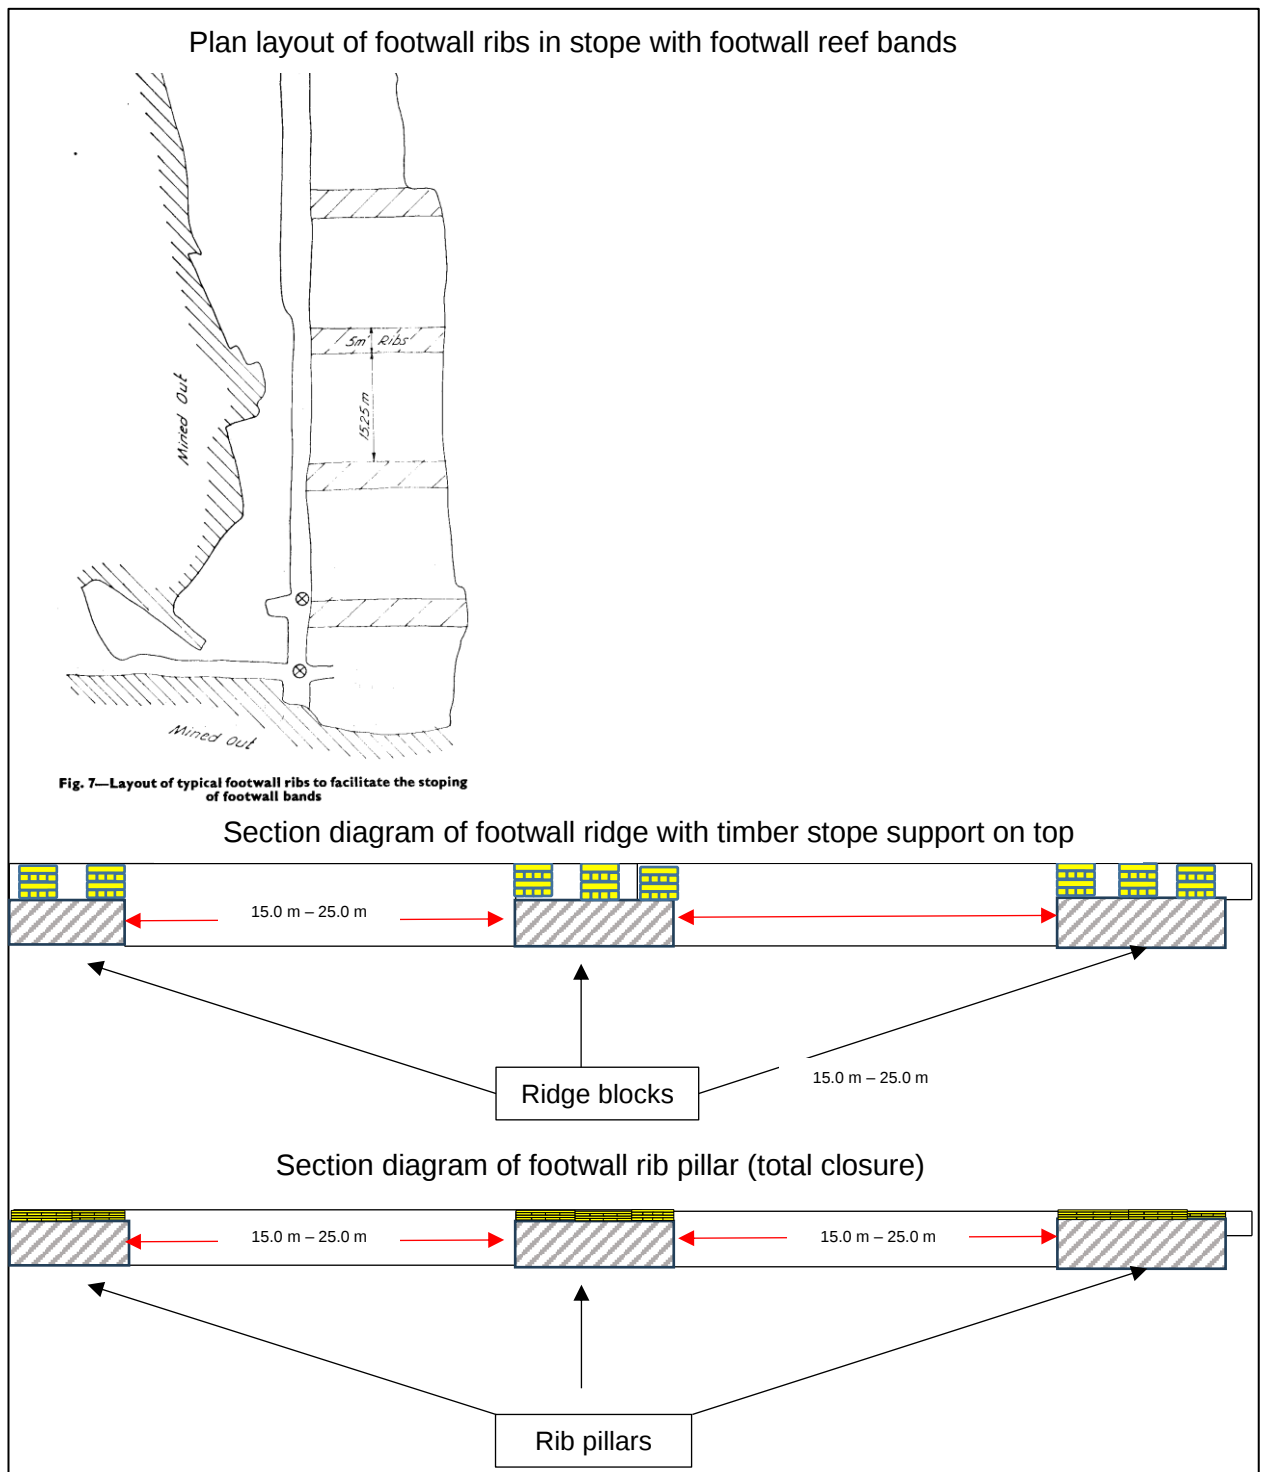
Layout (top) and section diagram (bottom) of footwall ribs for stoping of footwall bands (More O'Ferrall, 1981)
